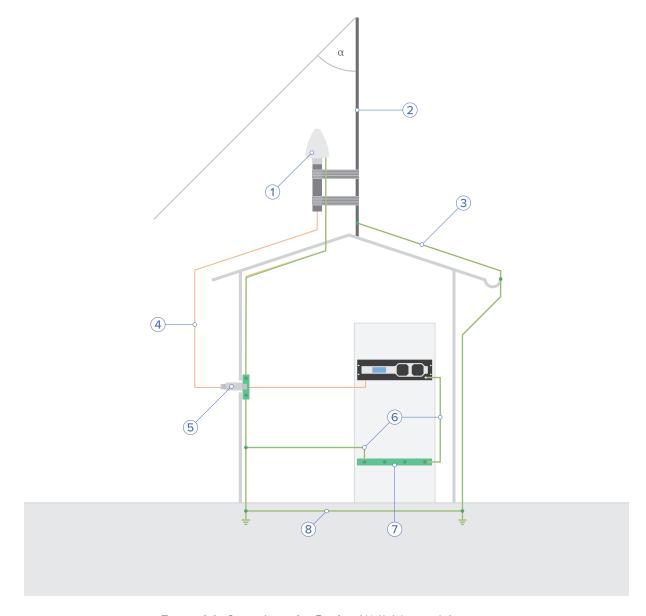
Grounding of a Roof or Wall-Mounted Antenna
